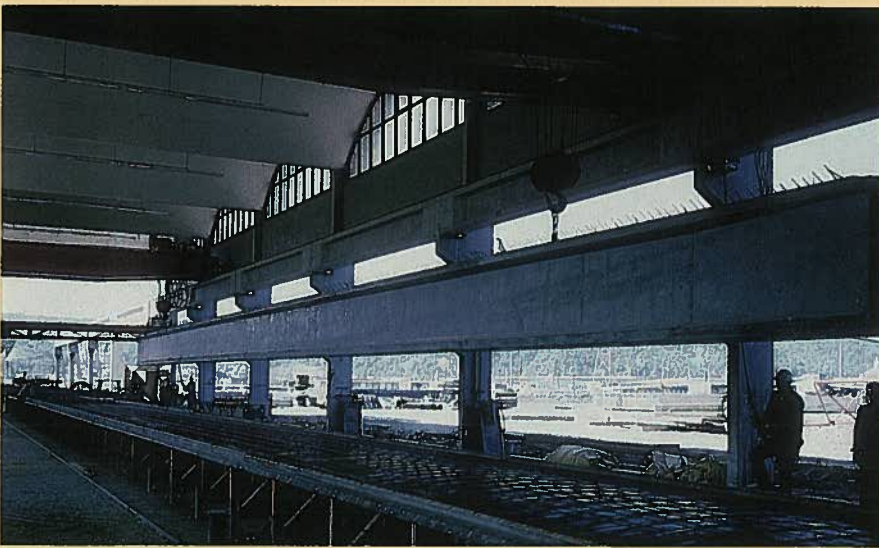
Tension flange of a 149 ft (45 m) barrel shell.
